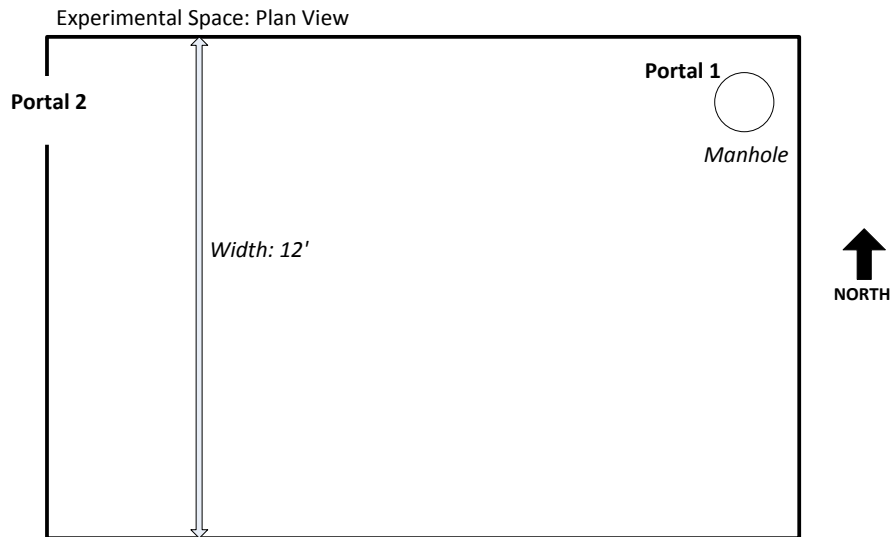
Plan view of experimental space with relative locations of ventilation openings
